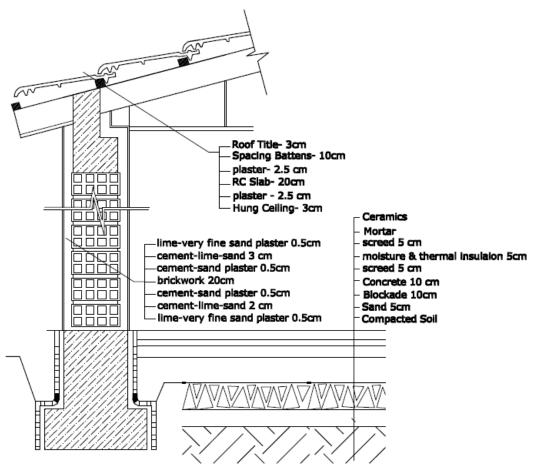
Construction Technique in Contemporary period- Brick wall- C₅
